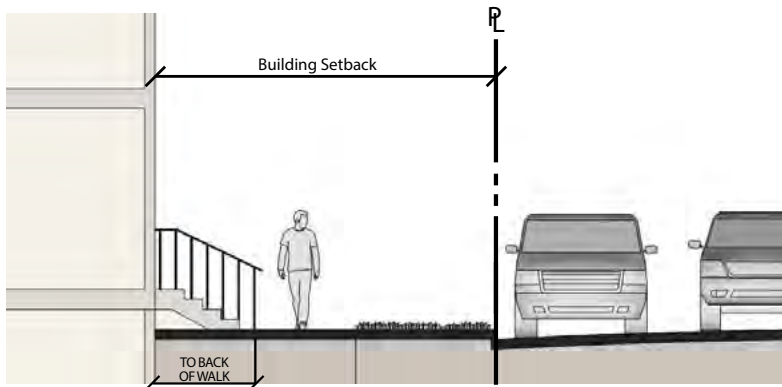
Neighborhood Street: Stairways, Front Stoeps, & Ramps
